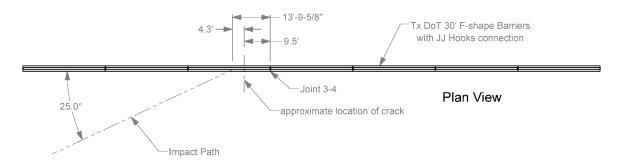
Target CIP for MASH TL-3 Test No. 440592-1 on Damaged Portable Concrete Barriers.
